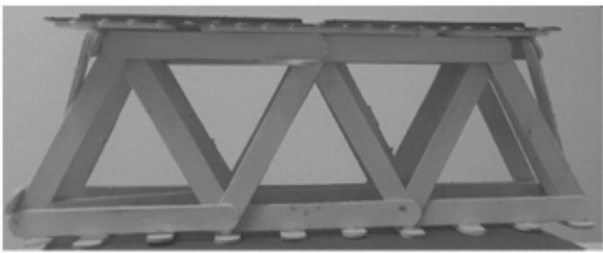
Team Bridge –Final Design of with top surface reinforcement
